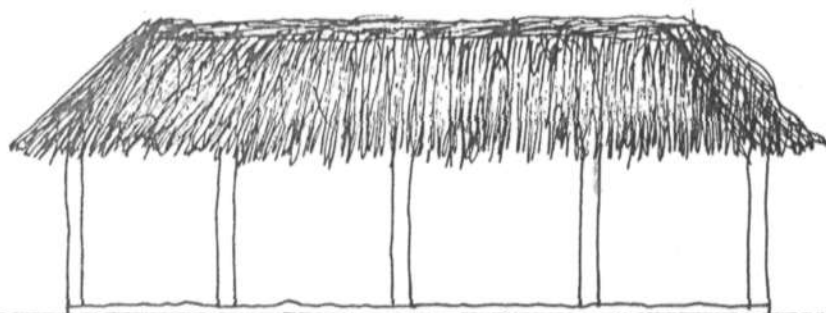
TYPICAL ELEVATION OF 'AJE' (MARKET SHED).
